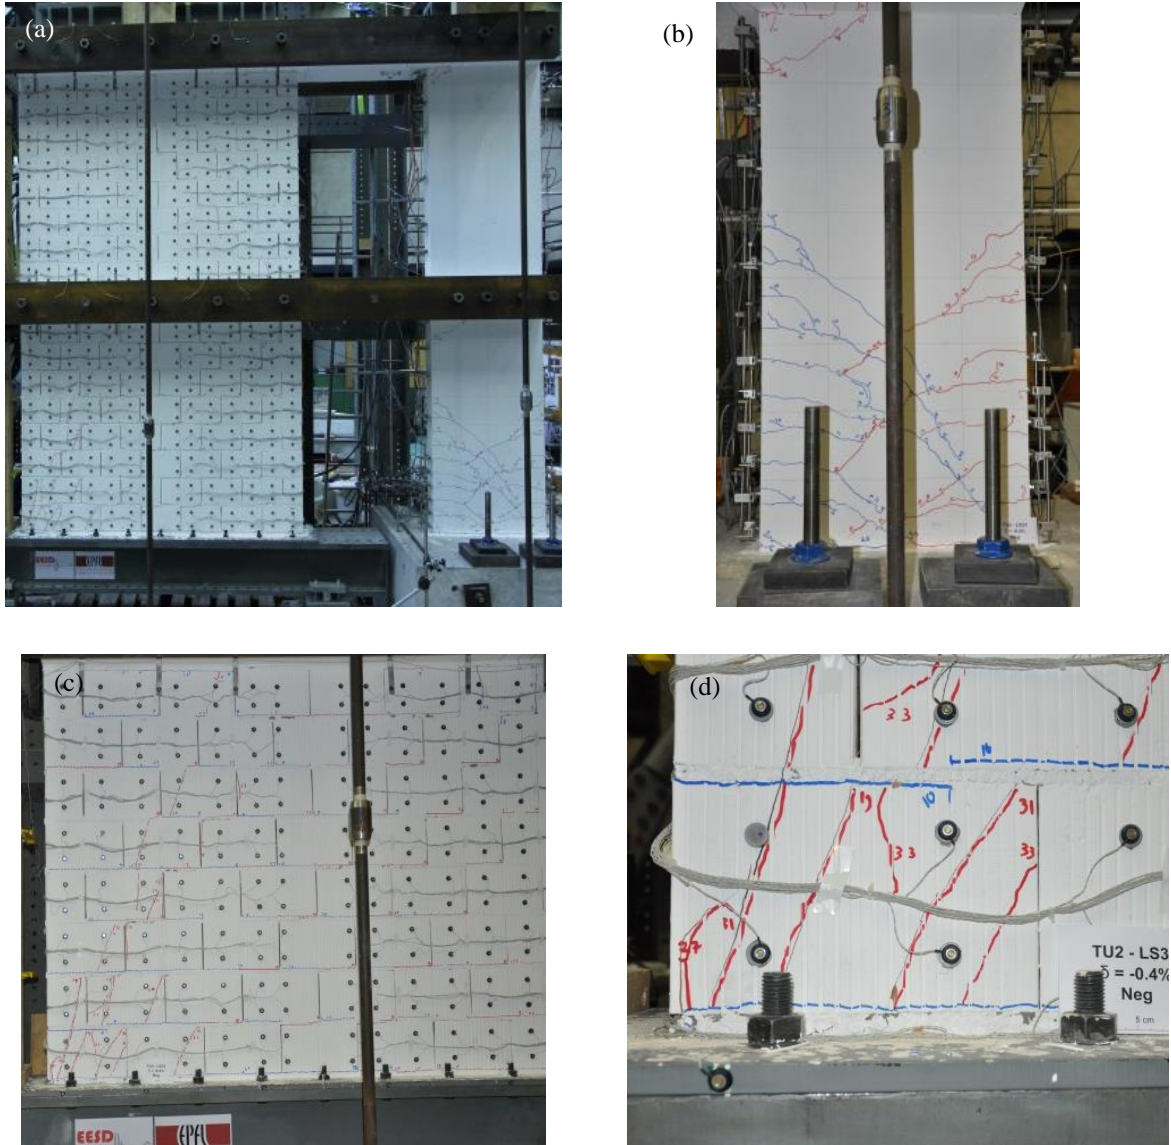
Crack pattern at LS33, $\delta = -0.4\%$. (a) specimen; (b, c) crack pattern at the bottom storey of the RC and URM wall; (d) compressed corner of the first storey of the URM wall.
